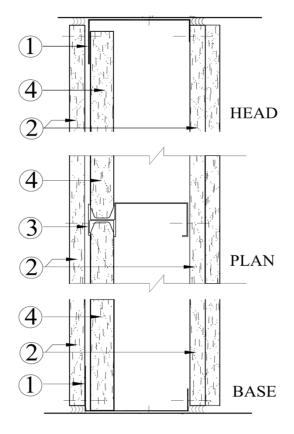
Three Hour Cavity Stair Wall (Non-Load Bearing)
